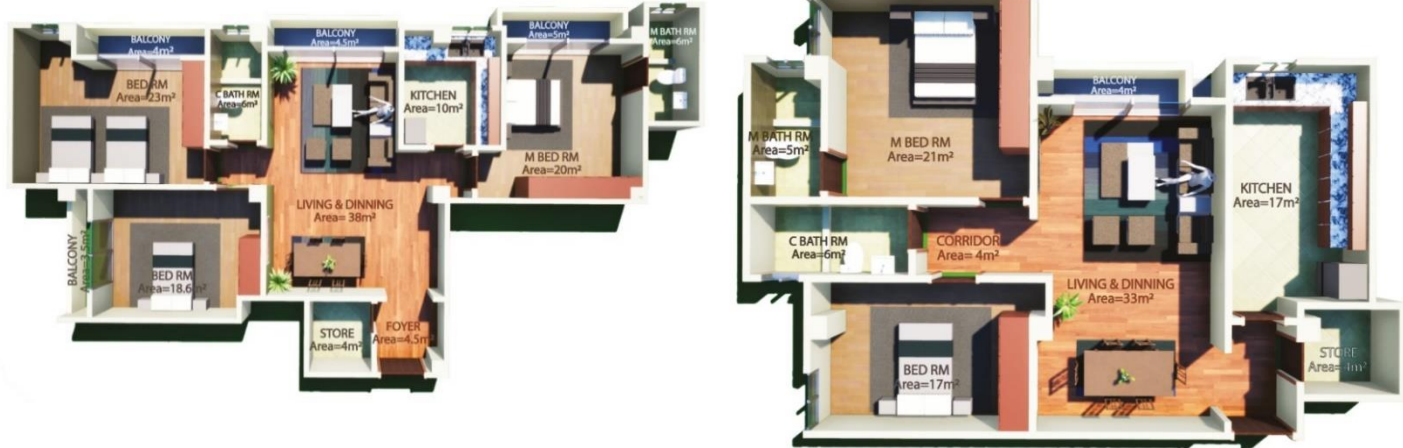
first floor plan, second to tenth typical floor plans for Global 6 apartment (source: Jambo real-estate)
